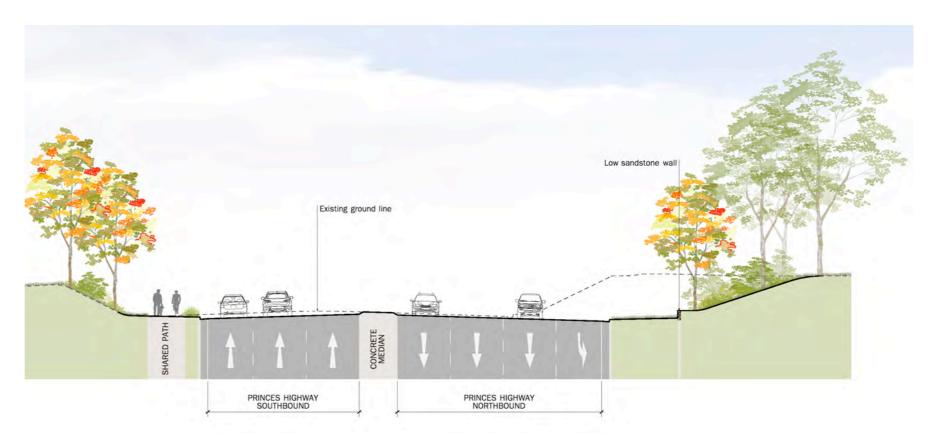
Section through the Princes Highway showing cutting embankments - Chainage 77720 (Scale 1:250)
